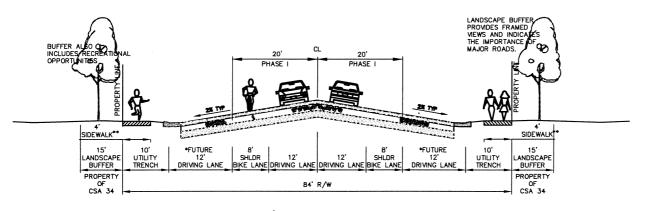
ROAD STANDARDS FOR MARINA DRIVE
